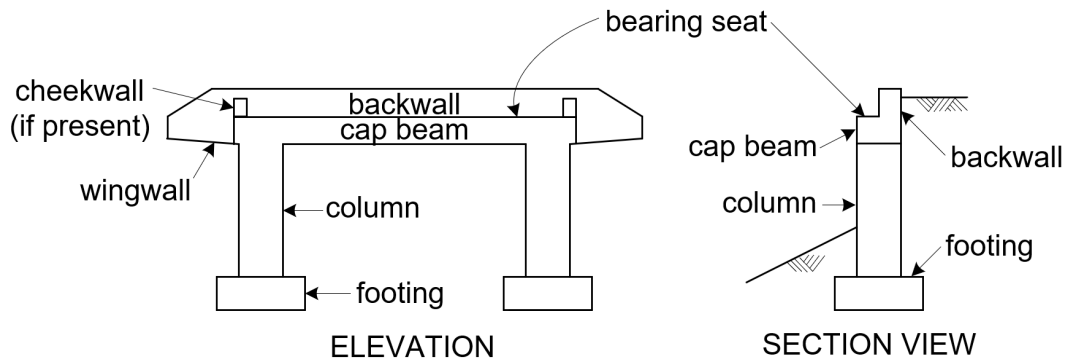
Sketch of Spill Through/Open Abutment
